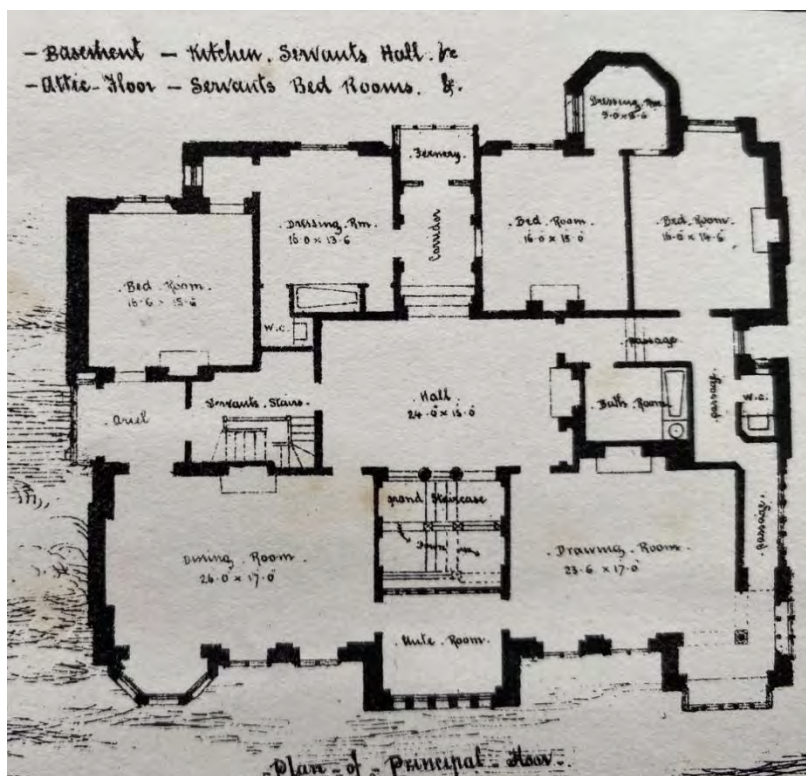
Plan of the principal floor at Bennett's house (1876) (*The Building News*, 8 December 1876)
